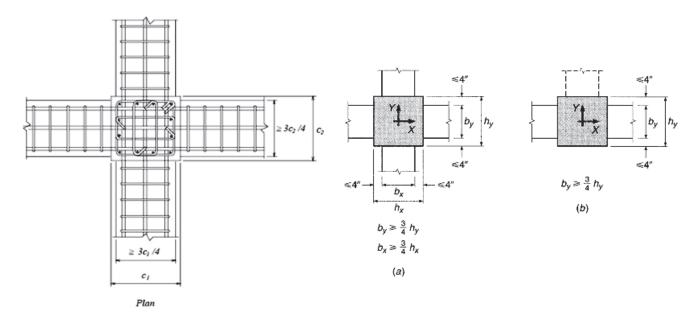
Minimum Beam Width with respect to Column Width to reduce Rebar Congestion and to improve Joint Performance
